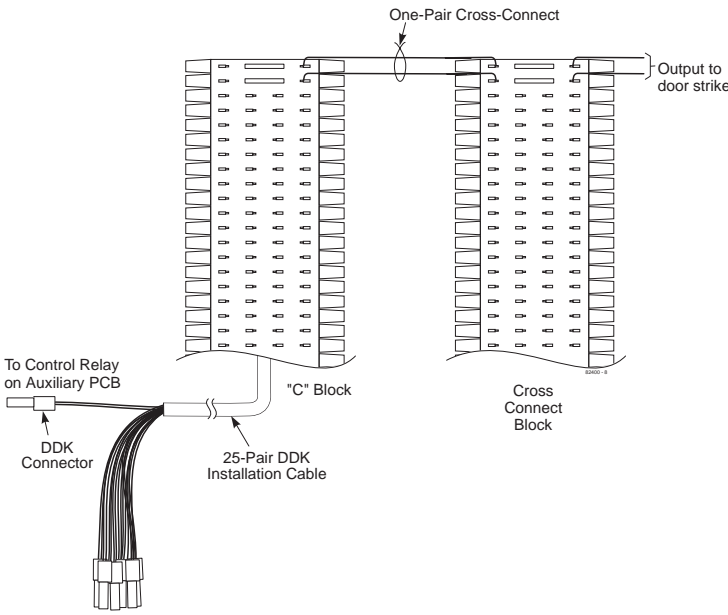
CONNECTING TO THE DOOR STRIKE
